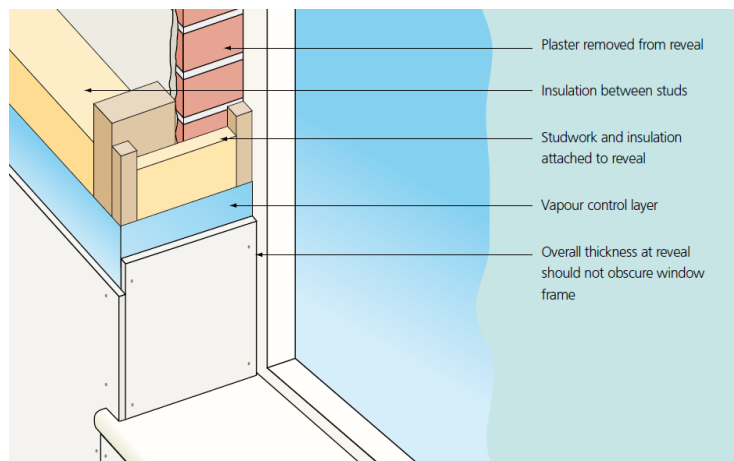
Example of studwork for masonry solid wall. Extracted from [46]
